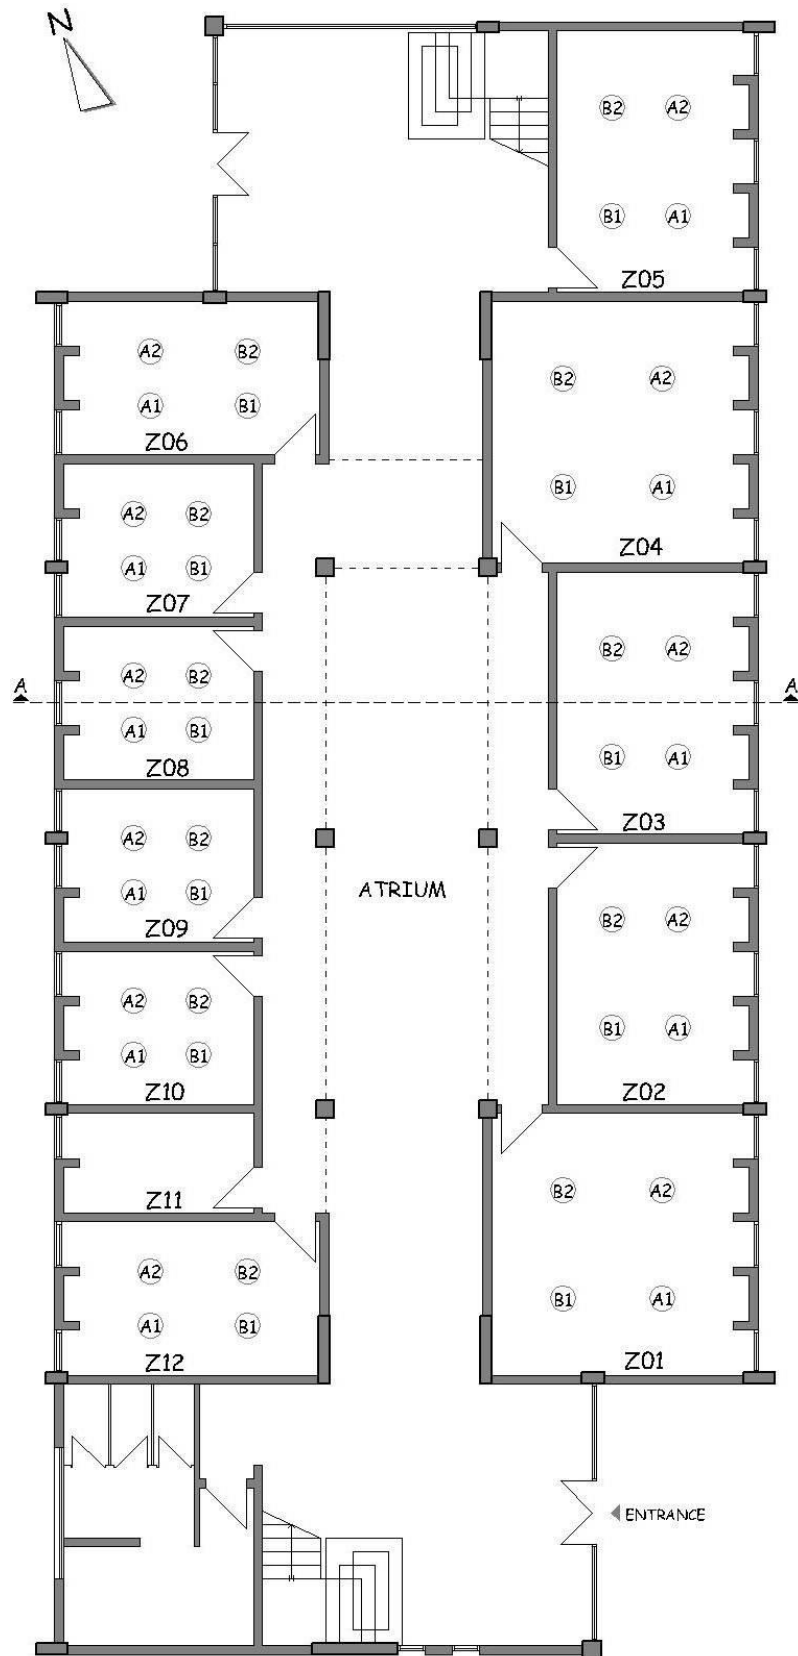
A schematic drawing of ground floor plan displaying illuminance measurement points
